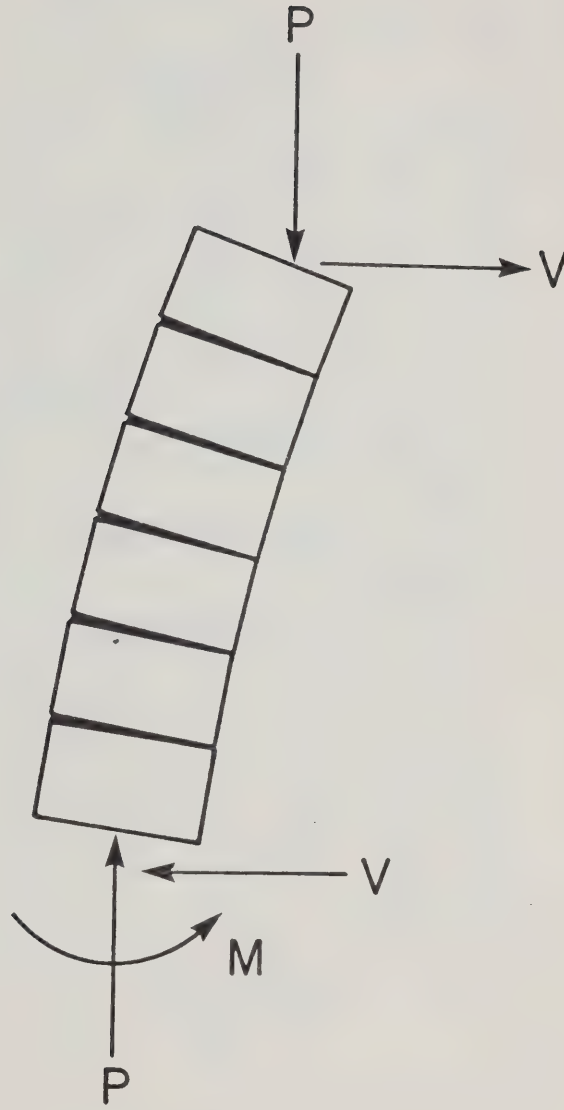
Forces Acting on the Cross-Section of an Eccentrically Loaded Wall Portion
